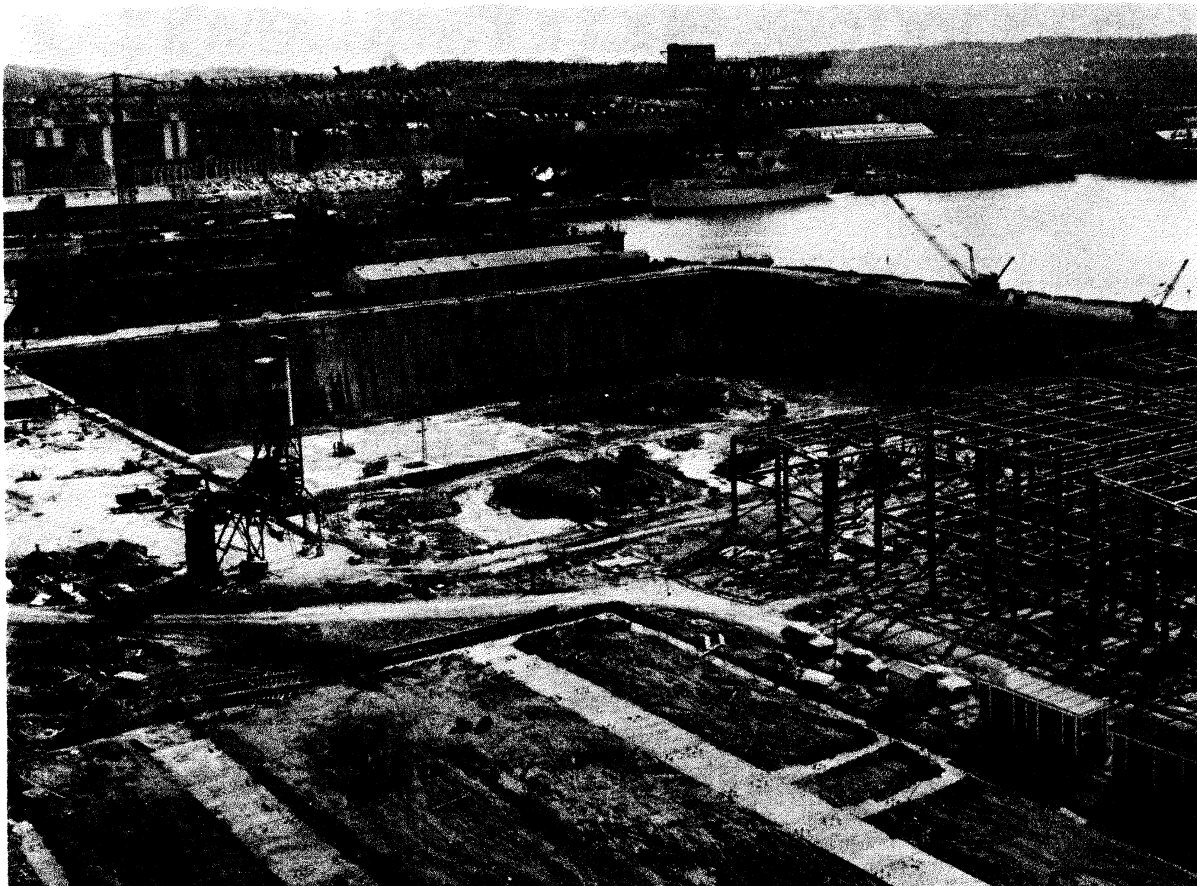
General view of dewatered basin prior of construction of dry docks at HM Dockyard, Davenport
